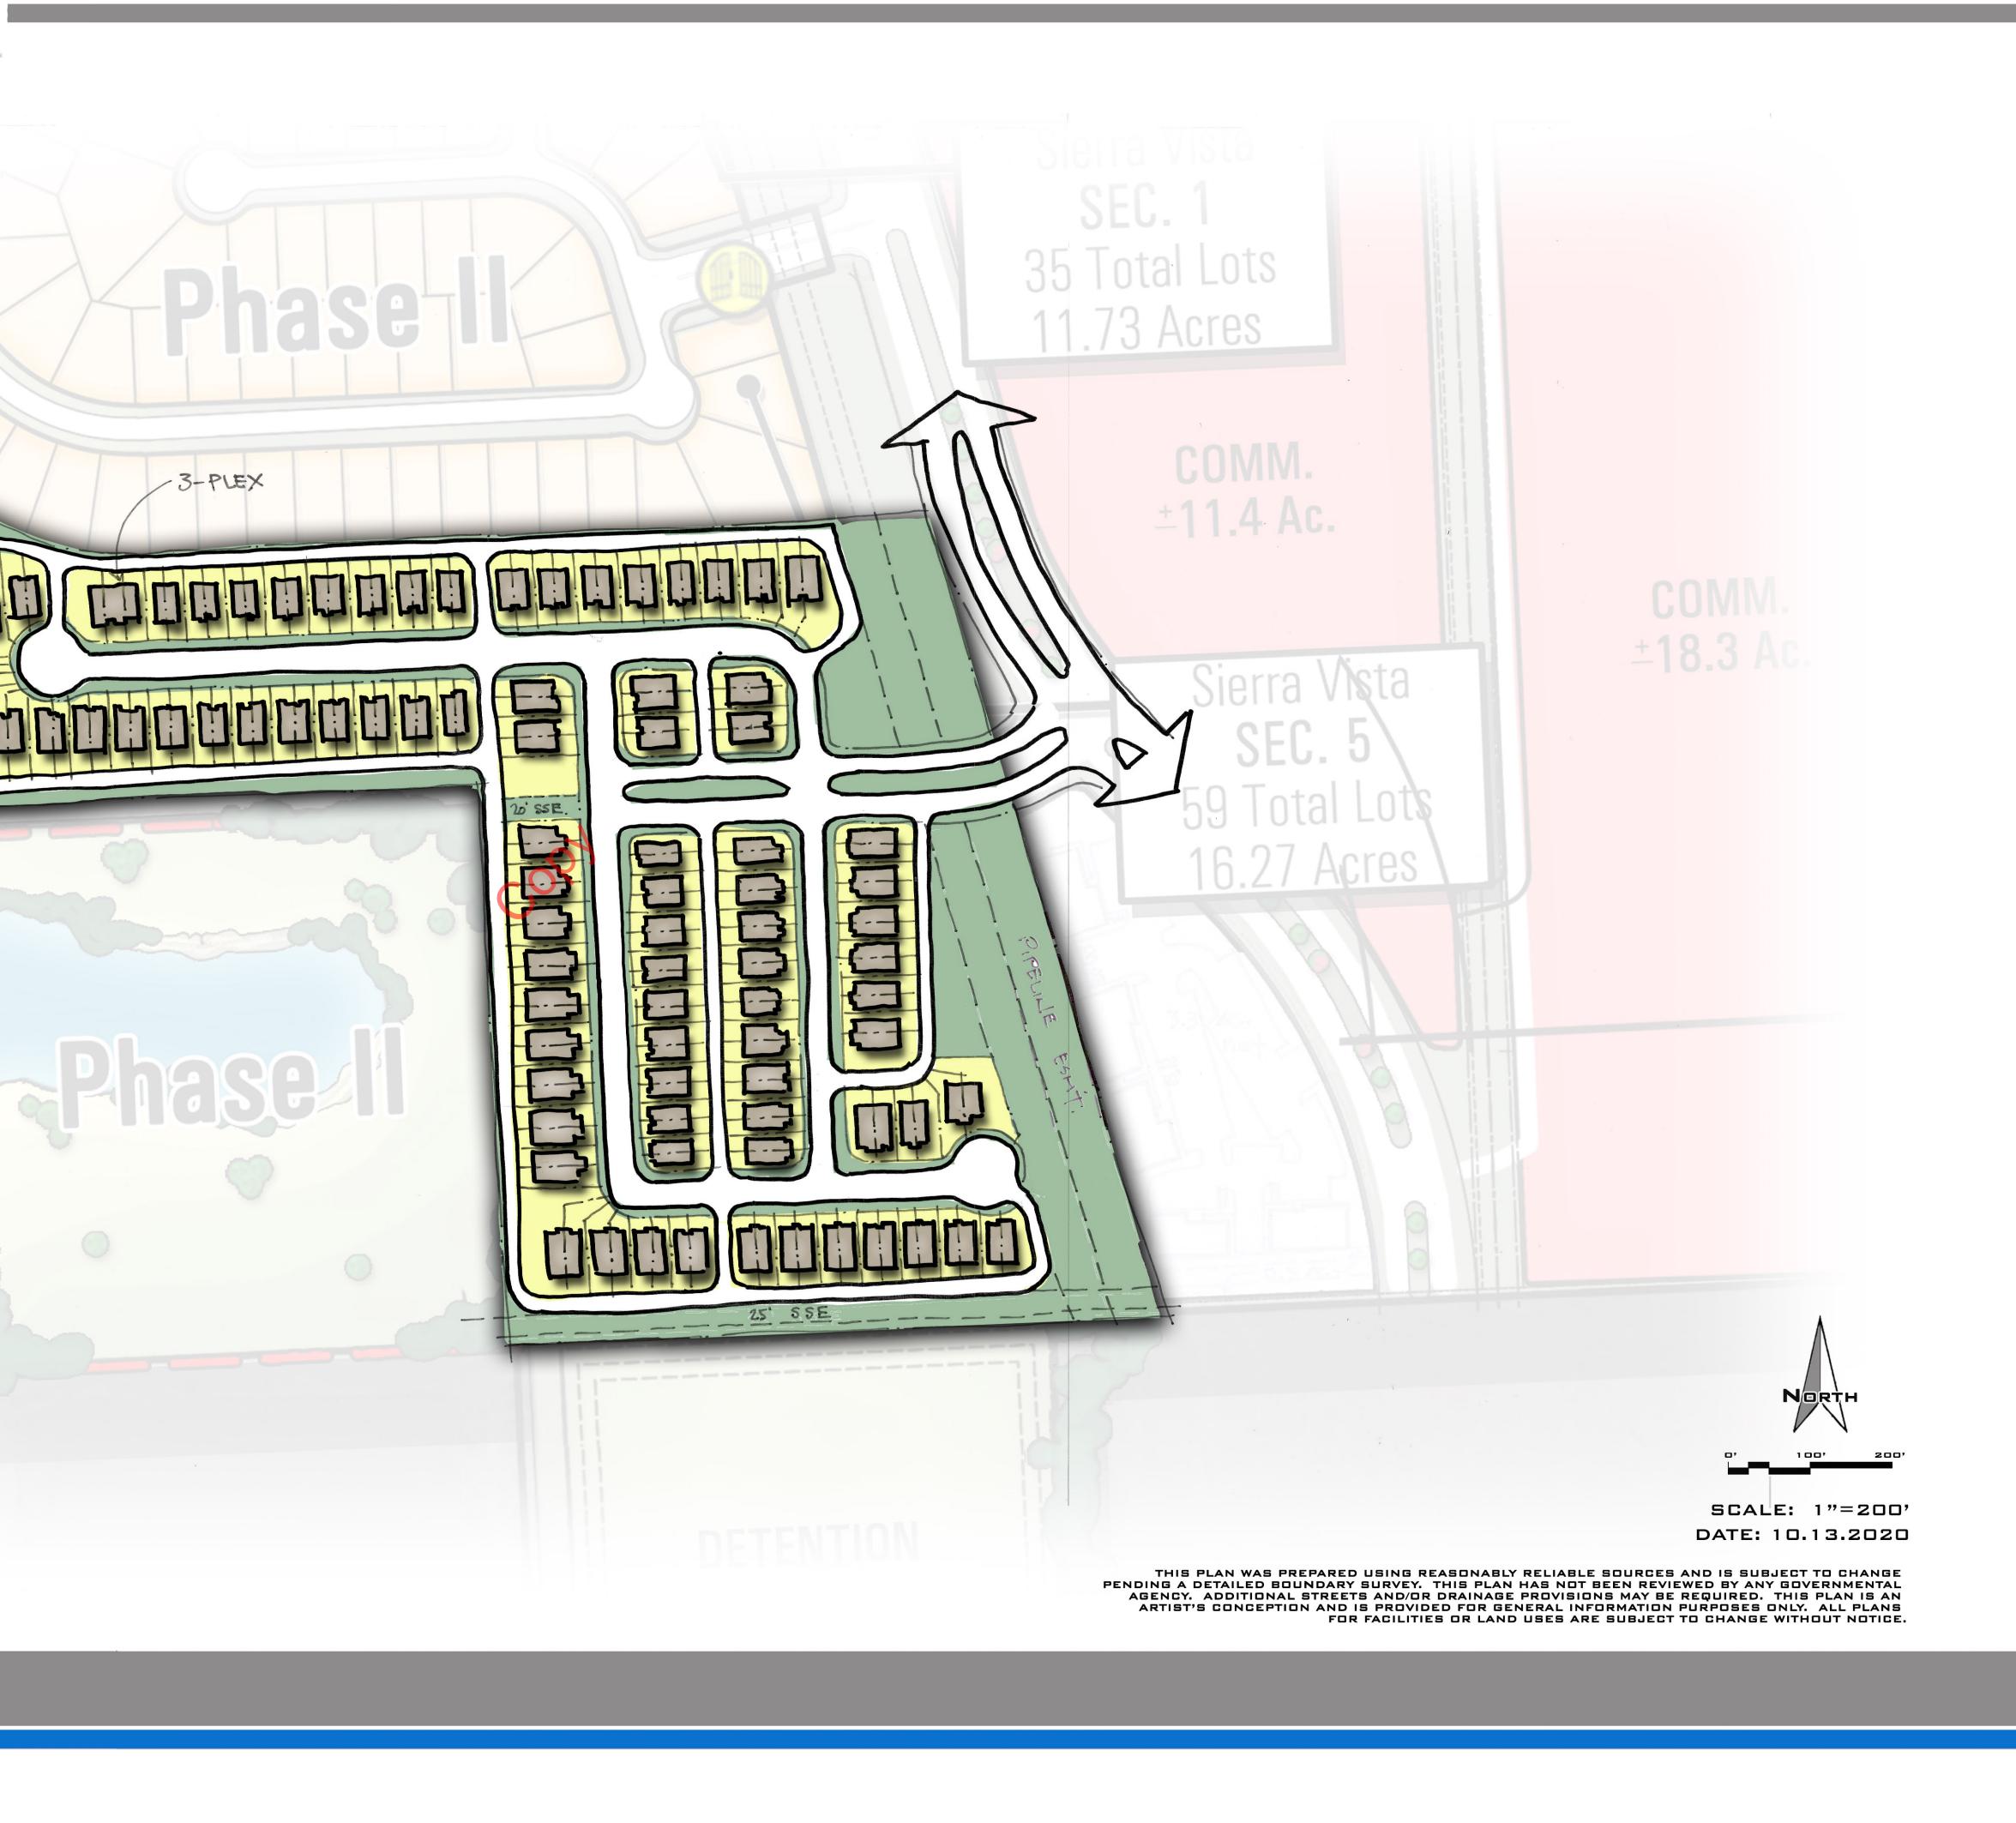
EXHIBIT B PLAN of DEVELOPMENT Sierra Vista West
